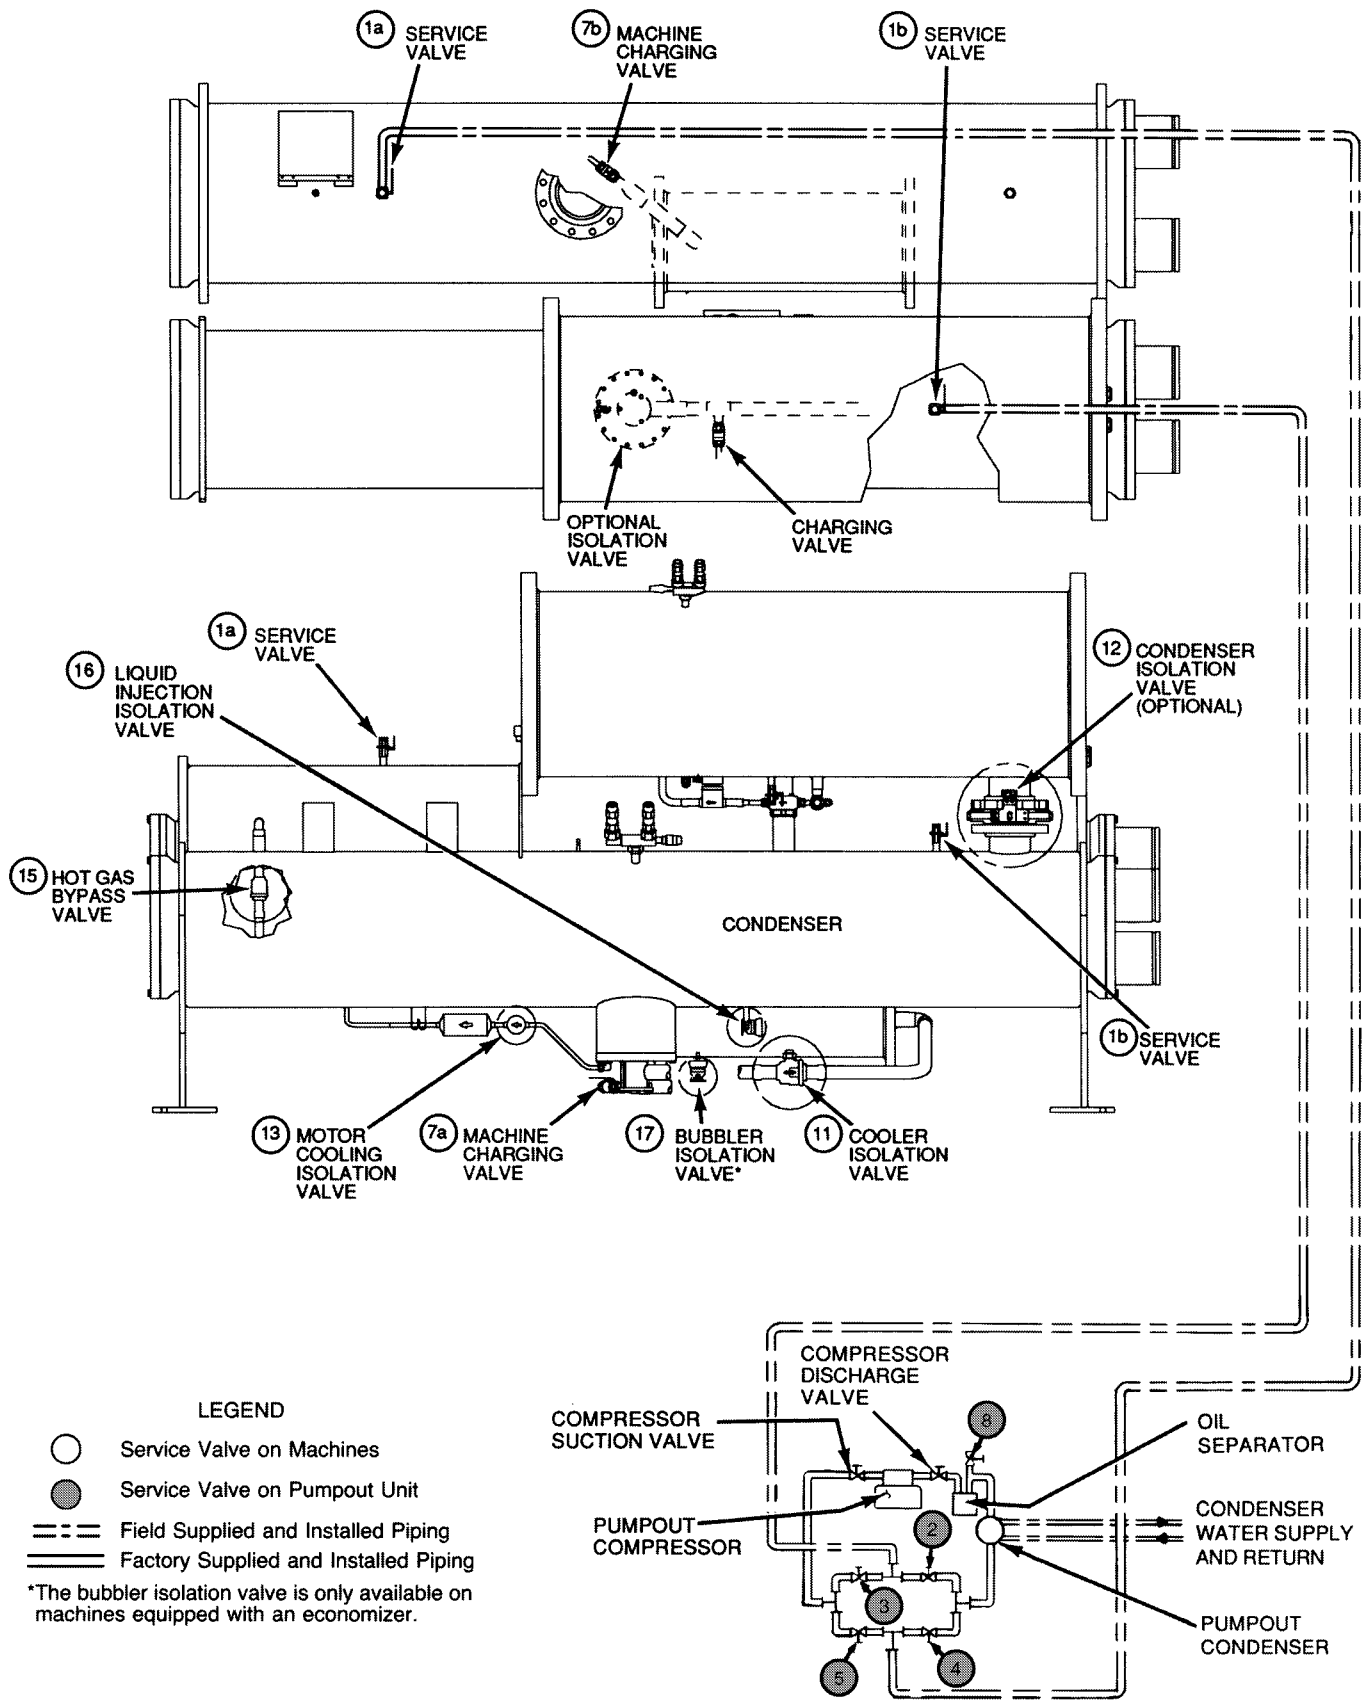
Typical Optional Pumpout System Piping Schematic With Storage Tank (Frame 4 Machines)
